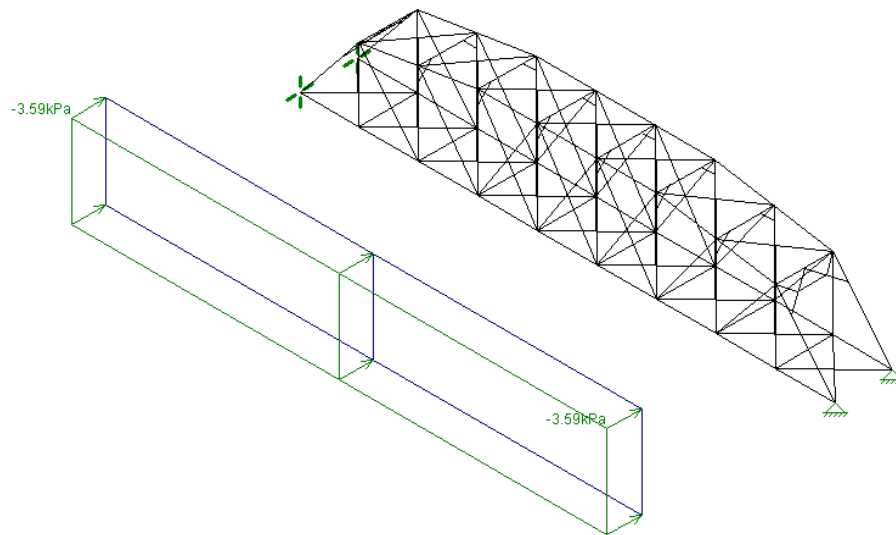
Prowers Bridge. Wind Pressure on the bridge.
